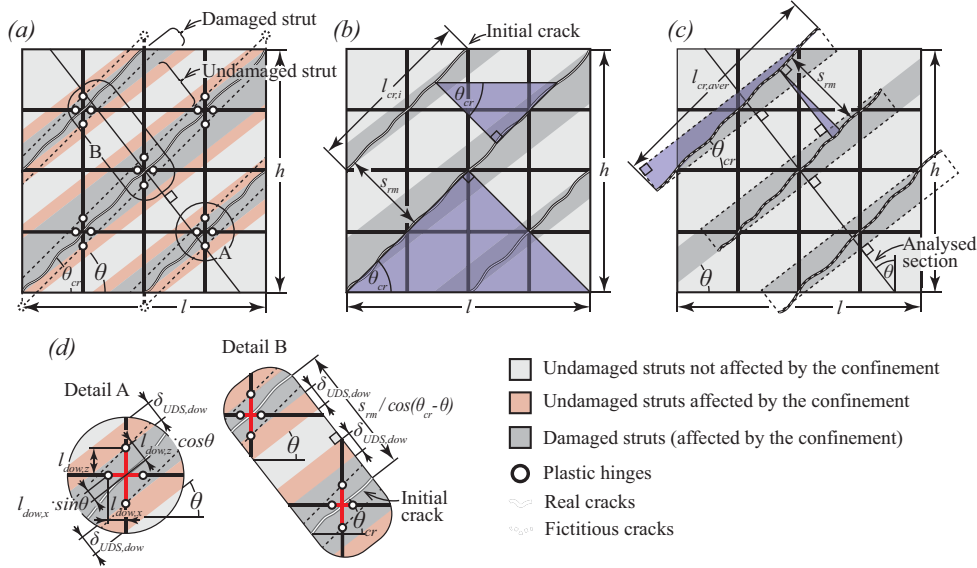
(a) Surface quantity and distribution of damaged and undamaged struts in a panel; (b) number of initial cracks in a panel; (c) effective damaged strut length and width; (d) details determining the confining concrete strut width
